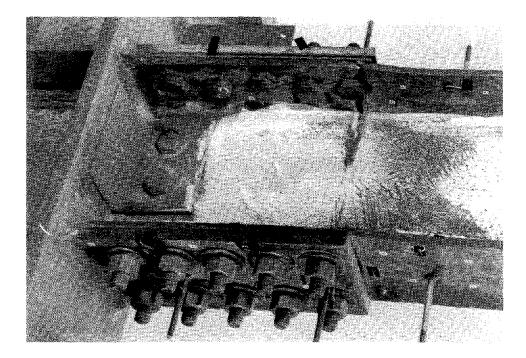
Fracture Across Net Section for Bolted Connection in Cyclic Test. (Beam Flanges are Unreinforced.)
